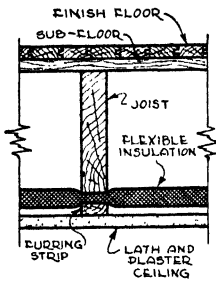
Sound Insulation Applied to Under Side of Ceiling Joists with Interior Finish Attached to Furring Strips
